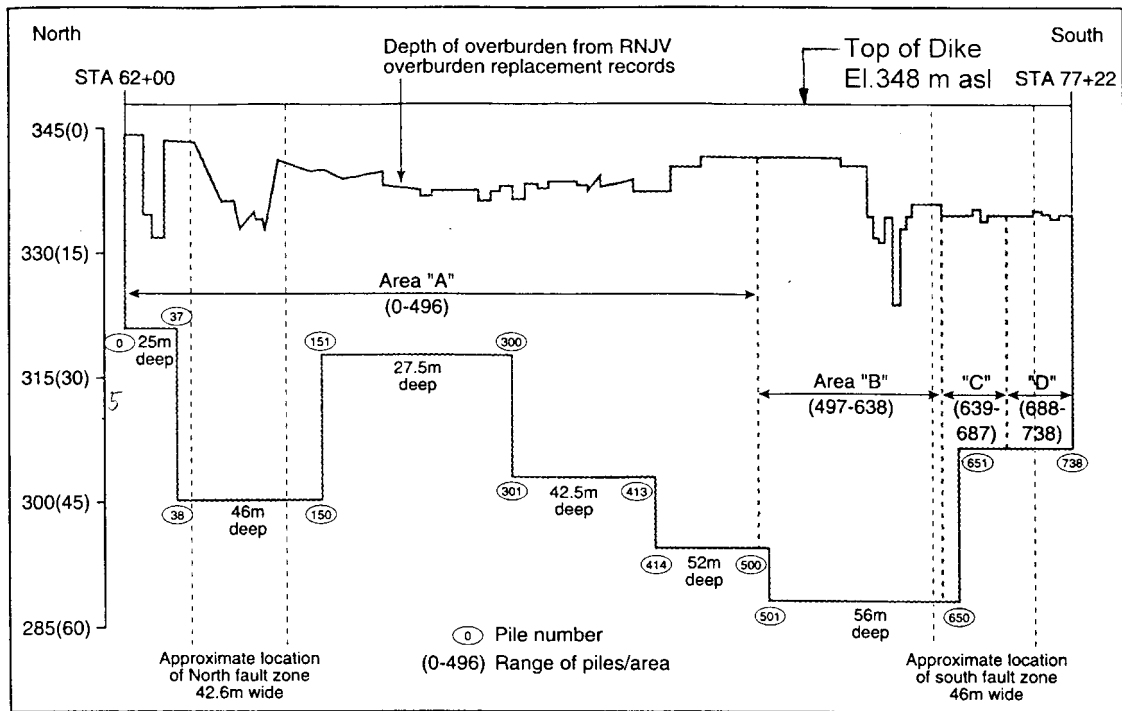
Beaver dam: Elevation of cutoff wall, showing depth of overburden and pile depths (Bruce & Stefani, 1996)
